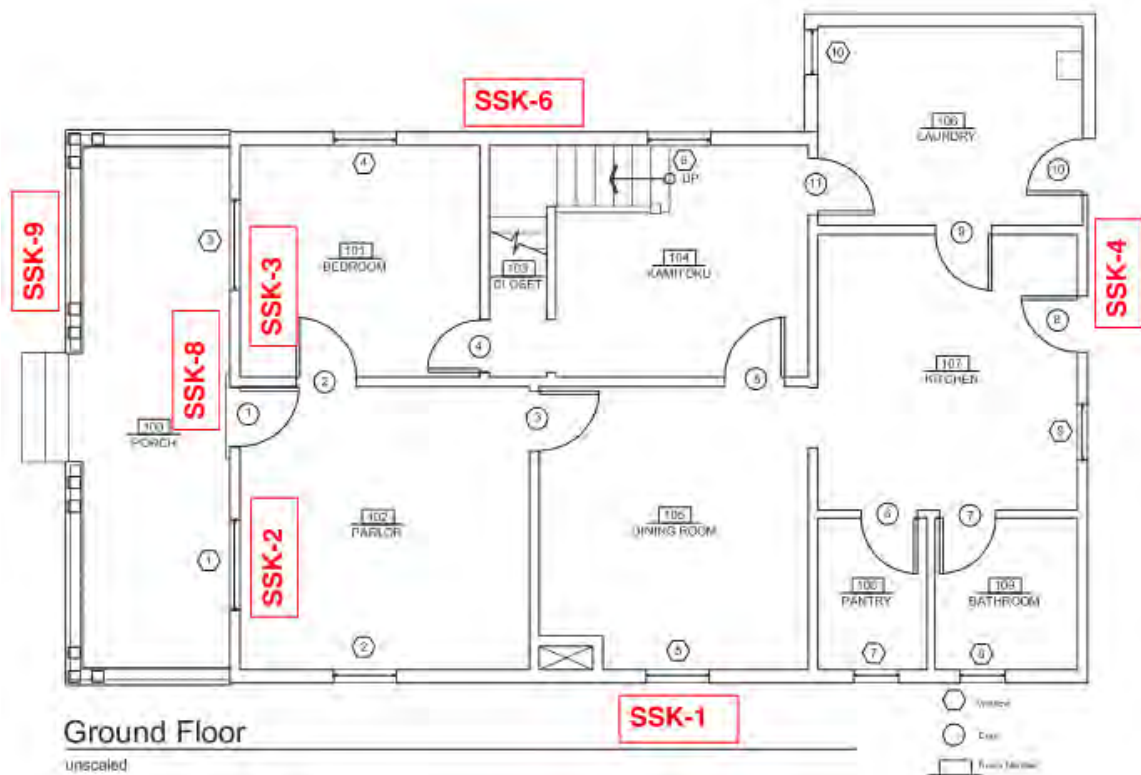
Ground Floor Temporary Immediate Repair Sketch Locations
